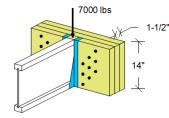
UNIFORM SIDE LOAD DESIGN EXAMPLE
